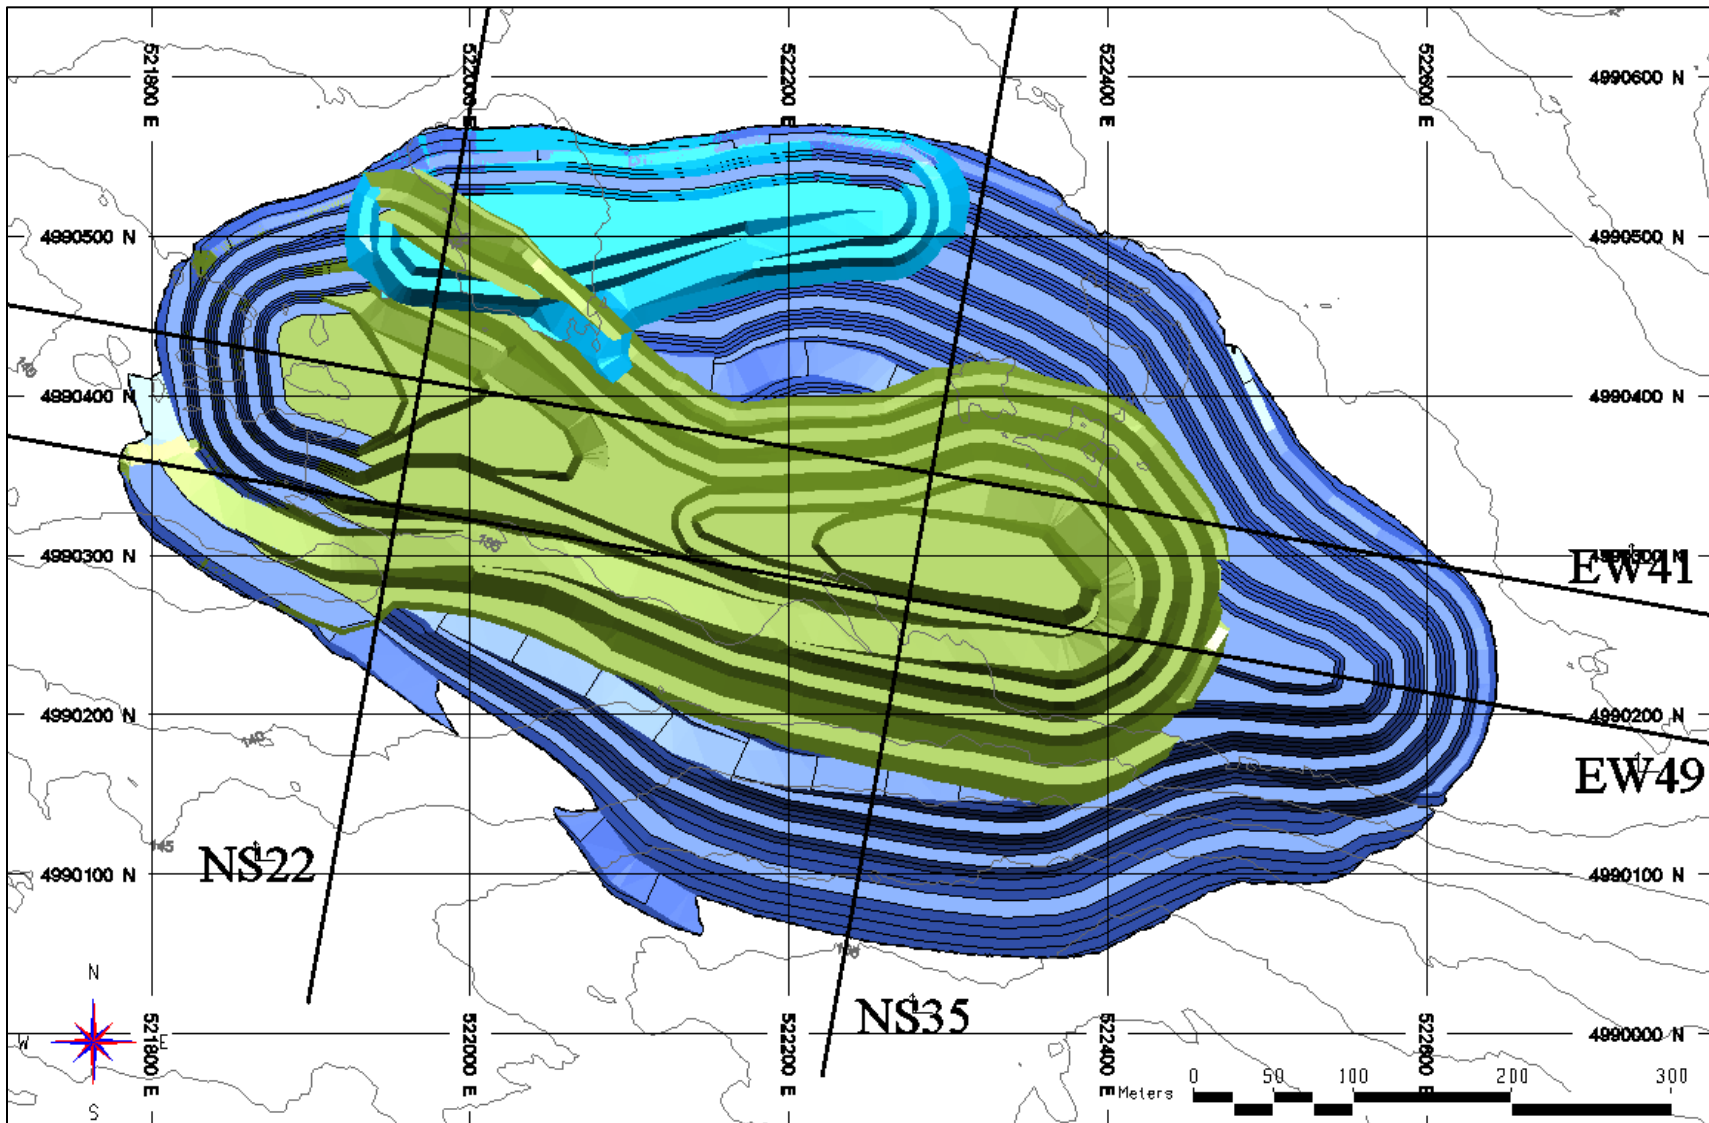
Nested Detailed Design Pit Phases, Plan View, P610 in cyan, P611 in green, P612 in blue (not for construction)
